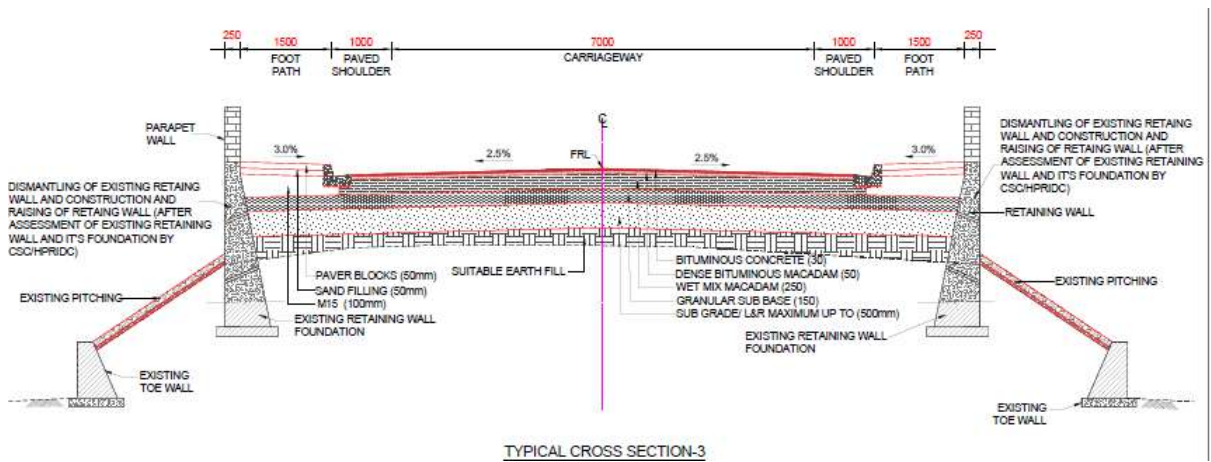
Typical Cross Section with Built-up Section (TCS-3)
